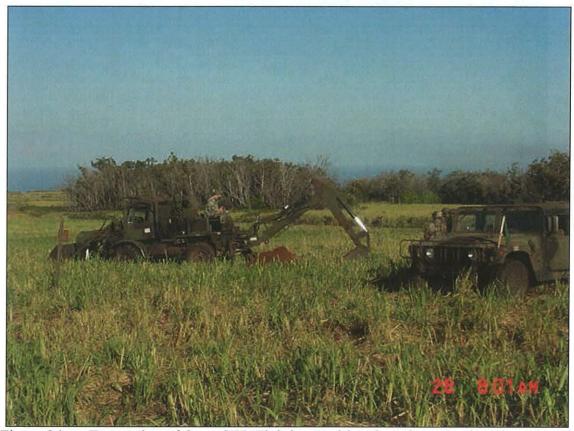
Excavation of Crew SER Fighting Position, by a SEE Truck. Viewed to North.
